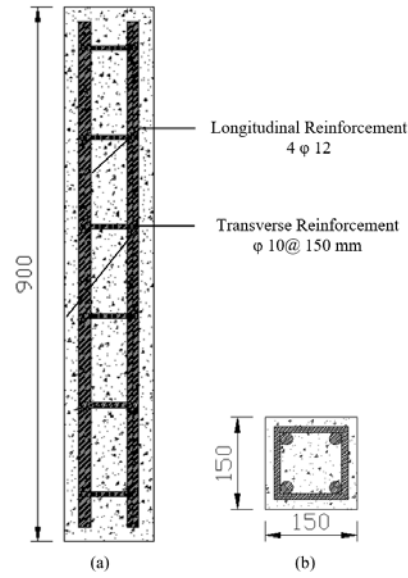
Reinforcement details for all specimens (a) profile and (b) cross-section
